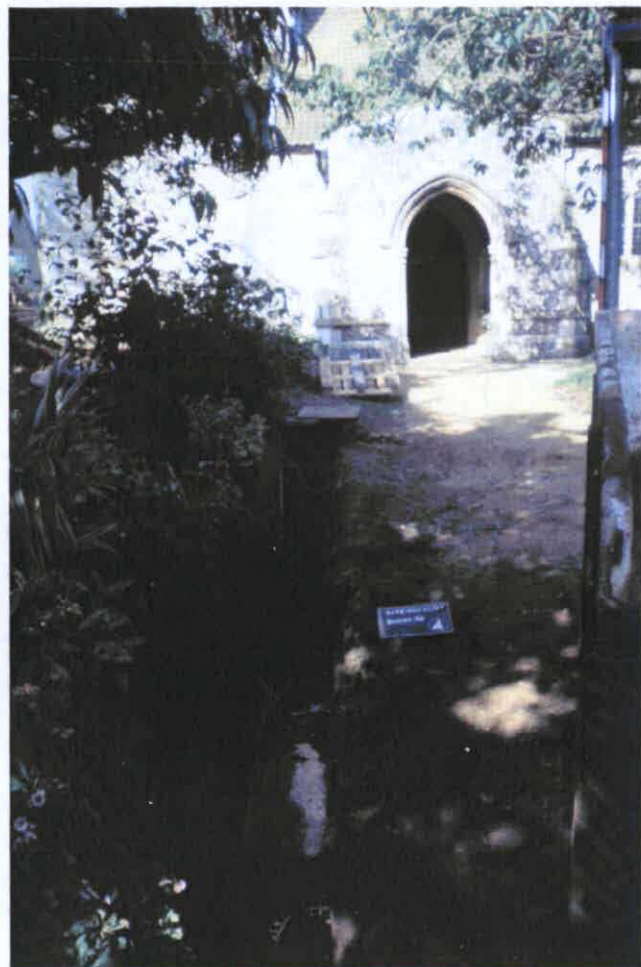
Service Trench along footpath, showing graveyard soil, looking north
